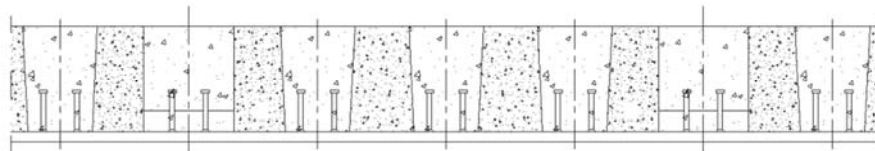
Connection between precast and cast in-situ concrete [105].
